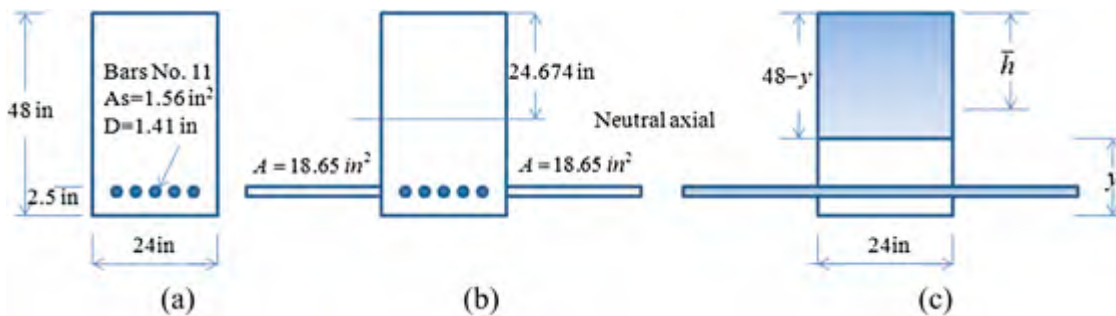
Girder section properties before and after the crack appears (1 in. = 25.4 mm): (a) original section; (b) transformed section before the crack; (c) transformed section after the crack
